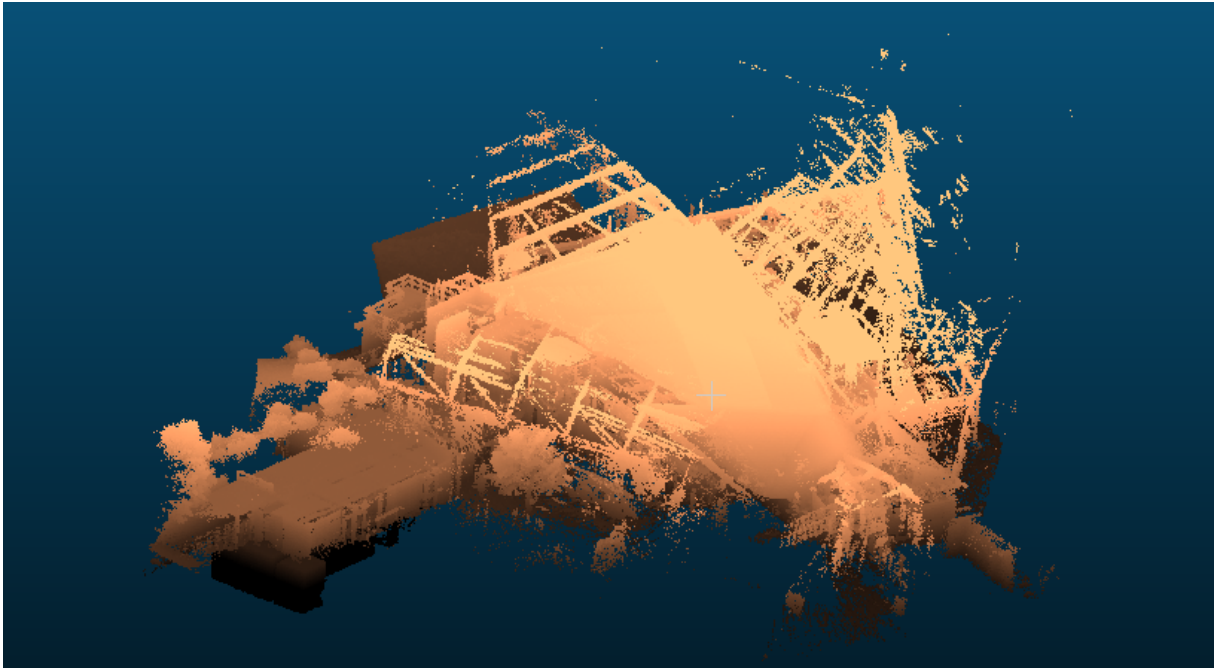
The point cloud for Hysolar building outdoors (South-West direction)
